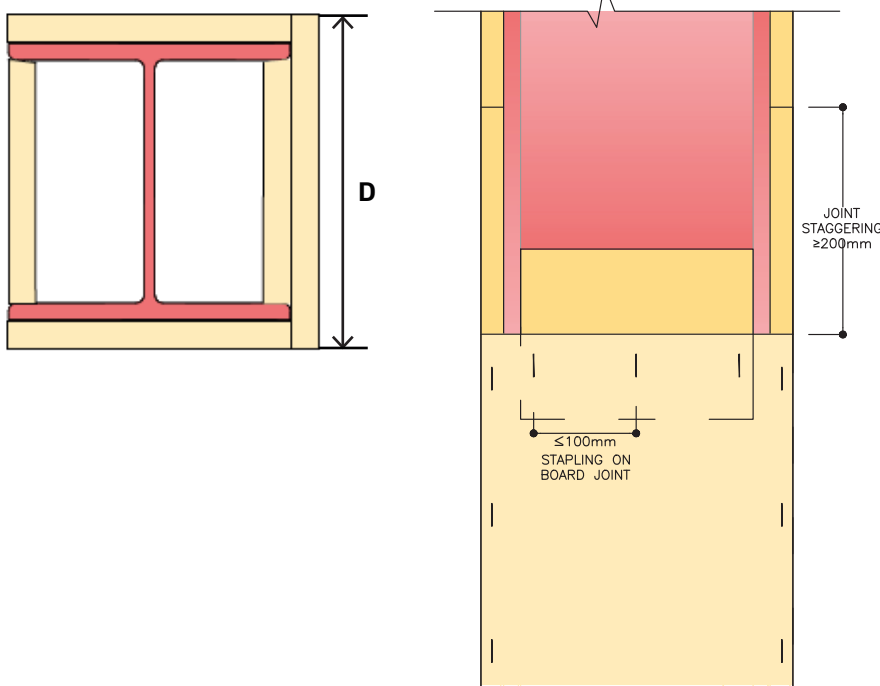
Plan and Elevation view of Universal Steel Column with installed Knauf Fireboard
